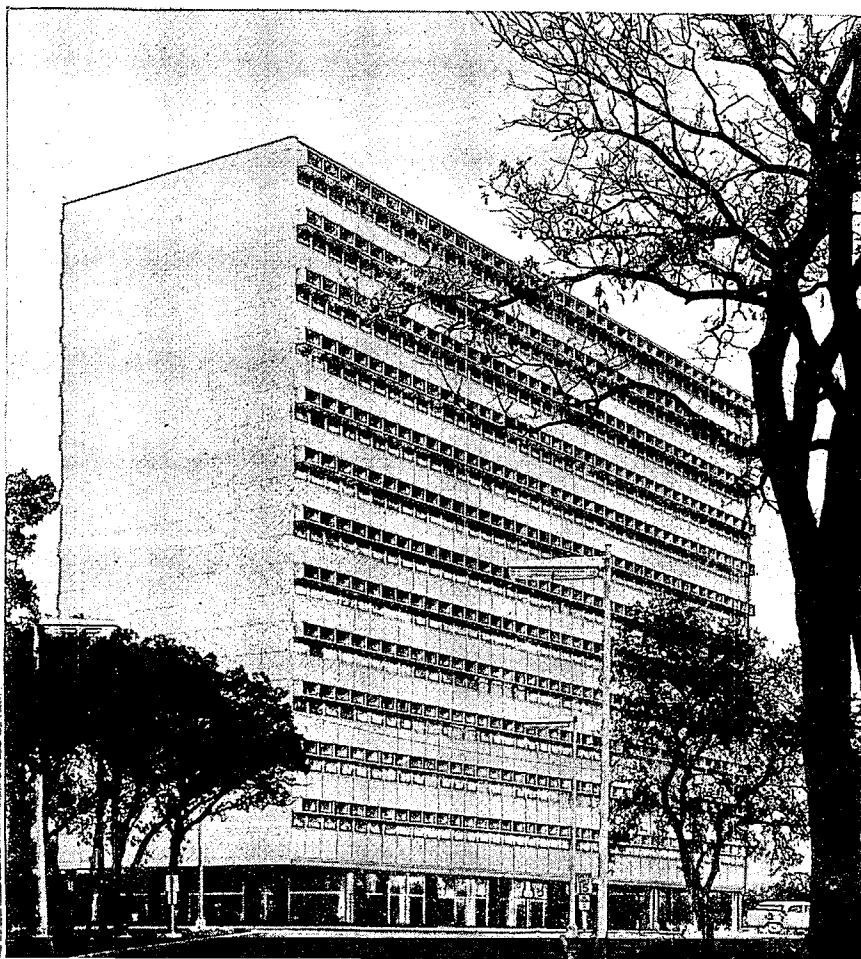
Exchange Bank and Office Building, Dallas (left); curtain-wall details (above and acrosspage). Thirteen-story structure having panel curtain-wall system supported by welded-steel tubing.
